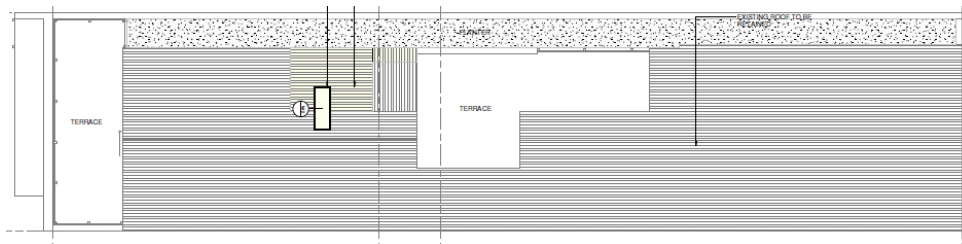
Proposed level 2 roof plan - 7/274 Arden Street, Coogee (Source: Place Studio)
